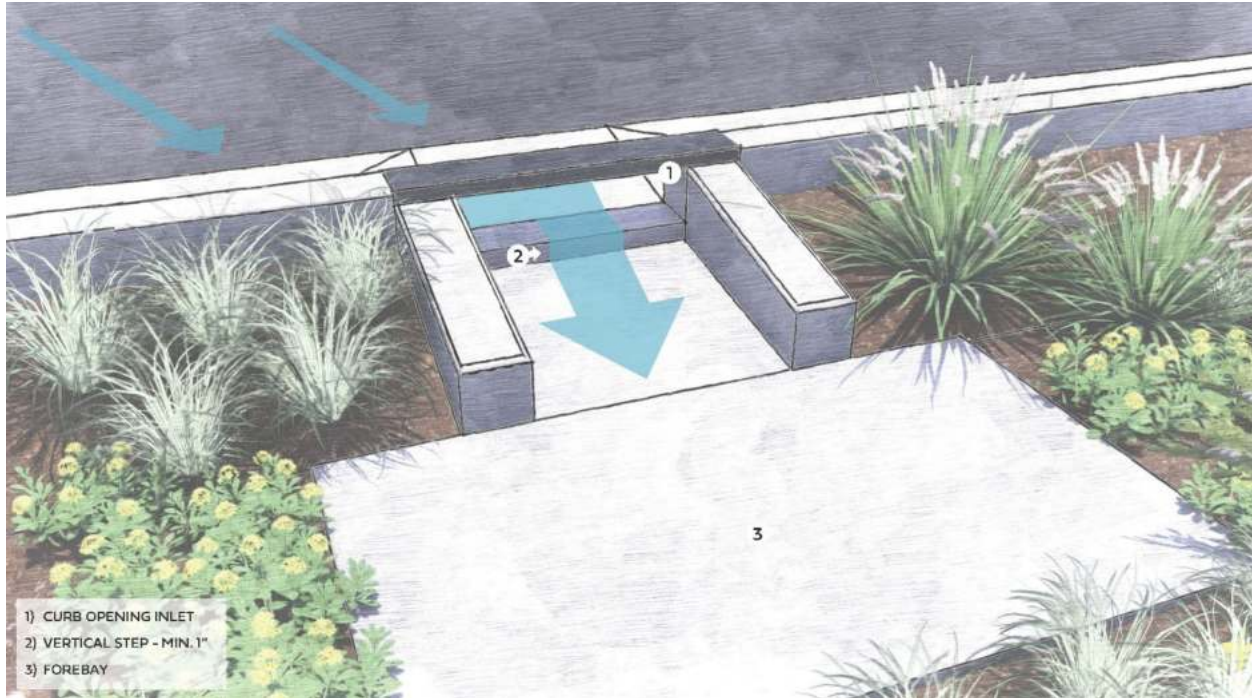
Curb Opening Inlet into Streetside Bioretention Area
